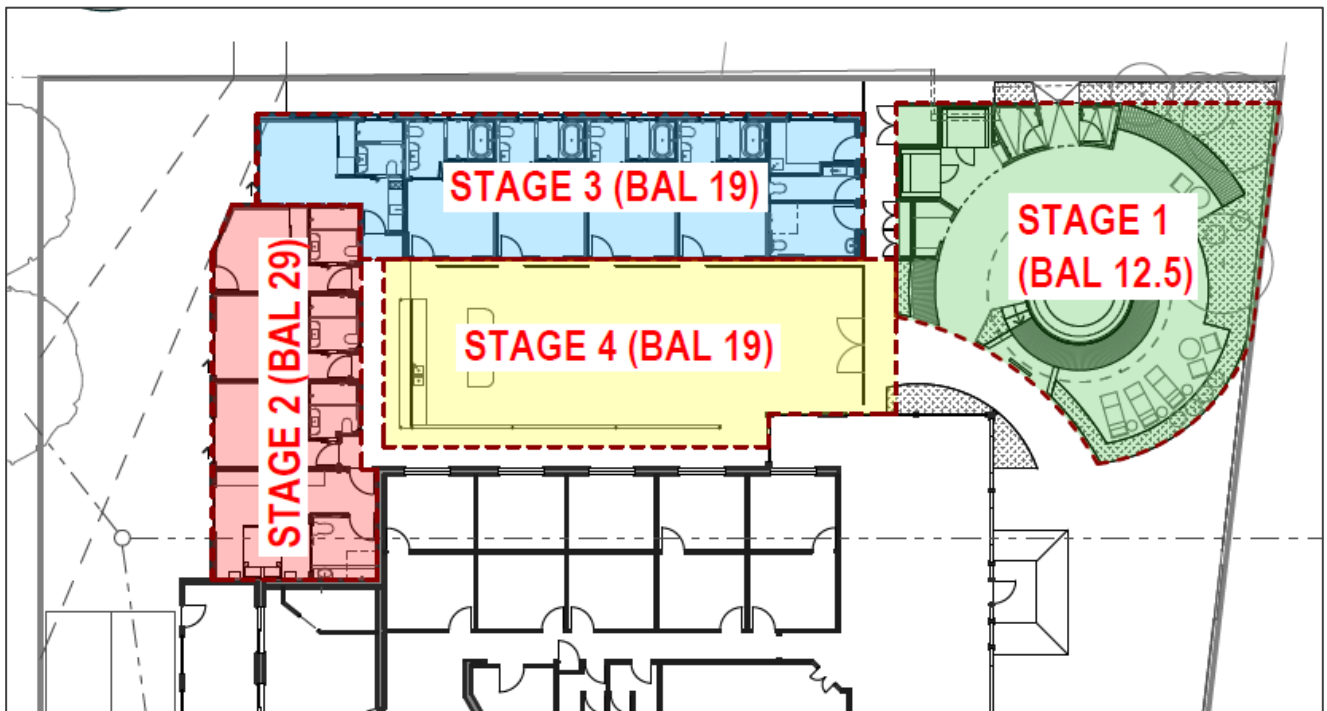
Architects detail of the BAL construction consistent with DA consent No. 10.2020.58.1 and the current BFSA, prior to application to modify.
